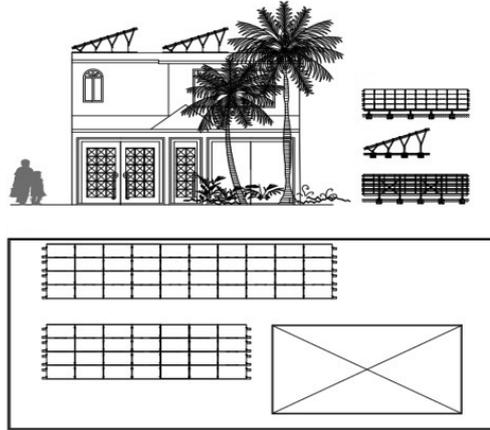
Elevation and plan of the SPV system on the roof of a typical building. Just note that there is more than enough space for the installations suggested in Table 4.13 on page 136.
